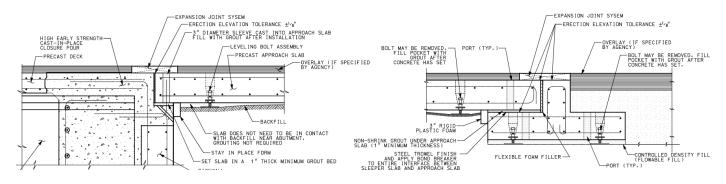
Connections at the abutment (left) and at sleeper slab (right) (PCI, 2012)
